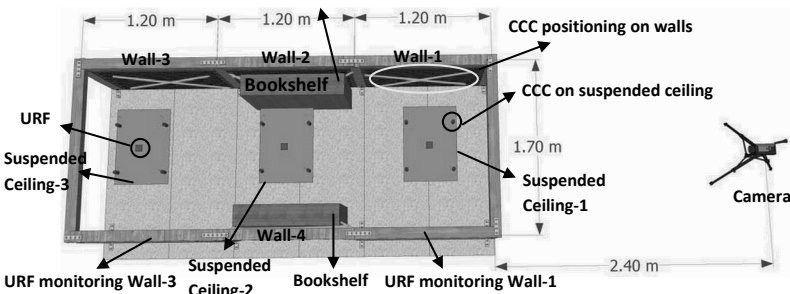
Positions of the building elements and the dimensions of the wider hallway model on a 3D sketch.
